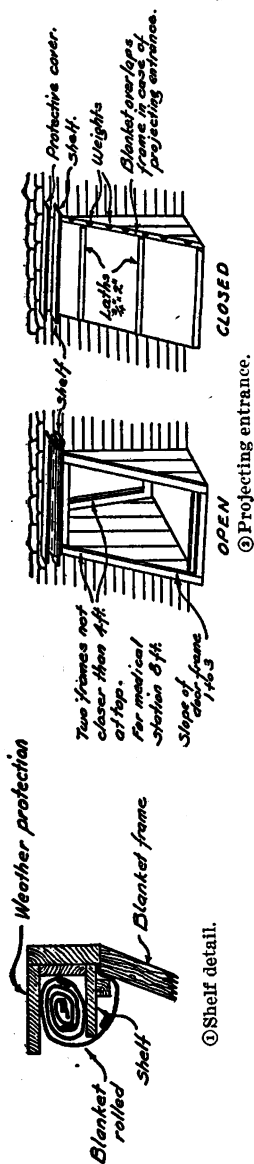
Typical arrangement for gas-proofing dugouts.
